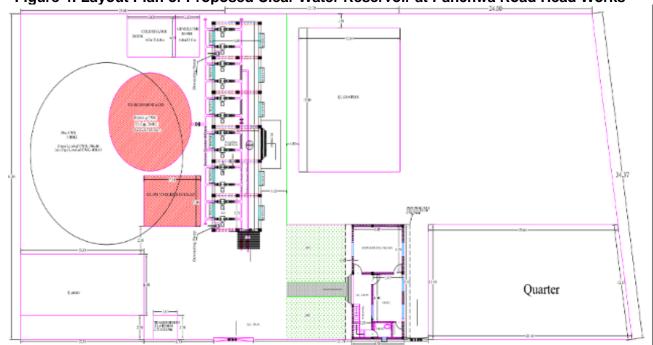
Layout Plan of Proposed Clear Water Reservoir at Panchwa Road Head Works
